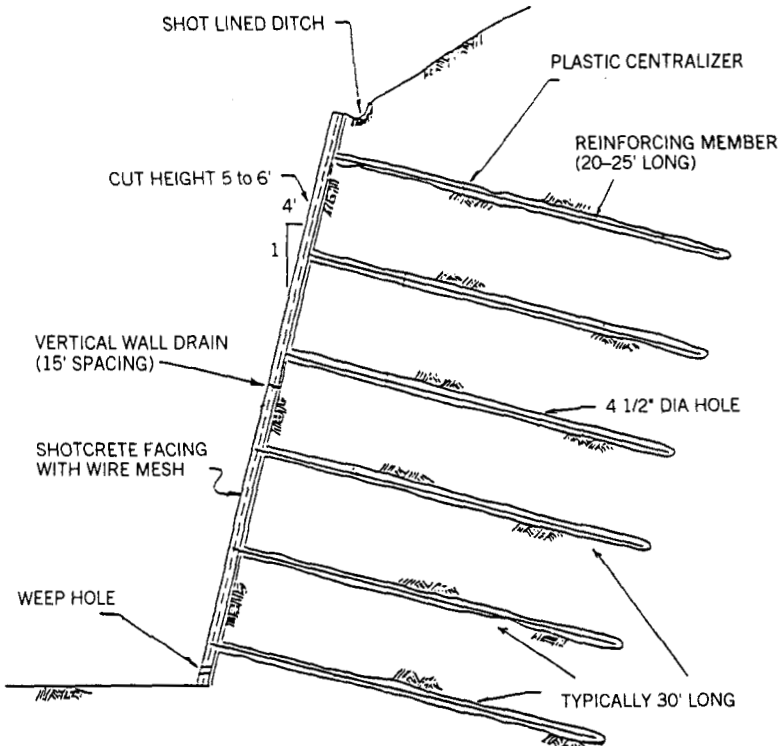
Elevation of Cumberland Gap wall. (From Nicholson, 1986.)
